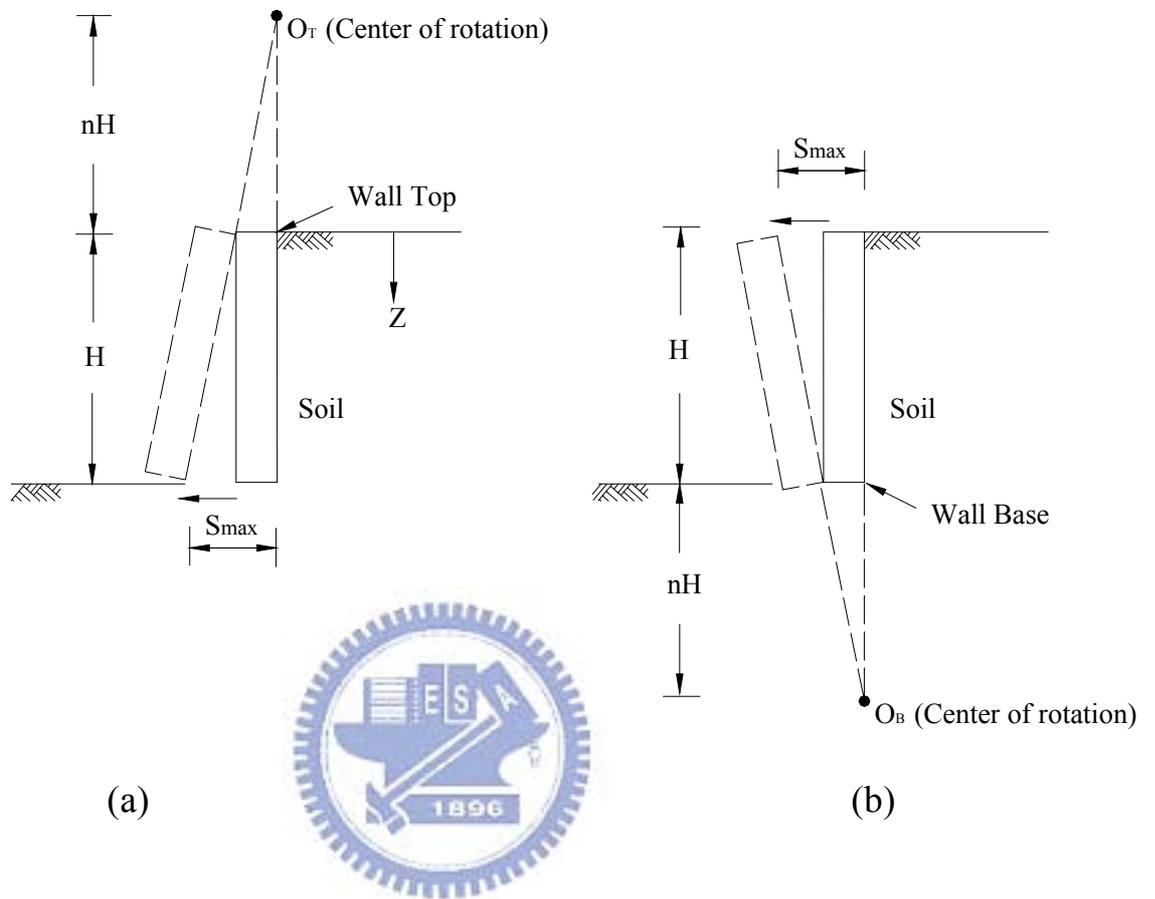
(a) Rotation about a point above wall top (RTT mode);
